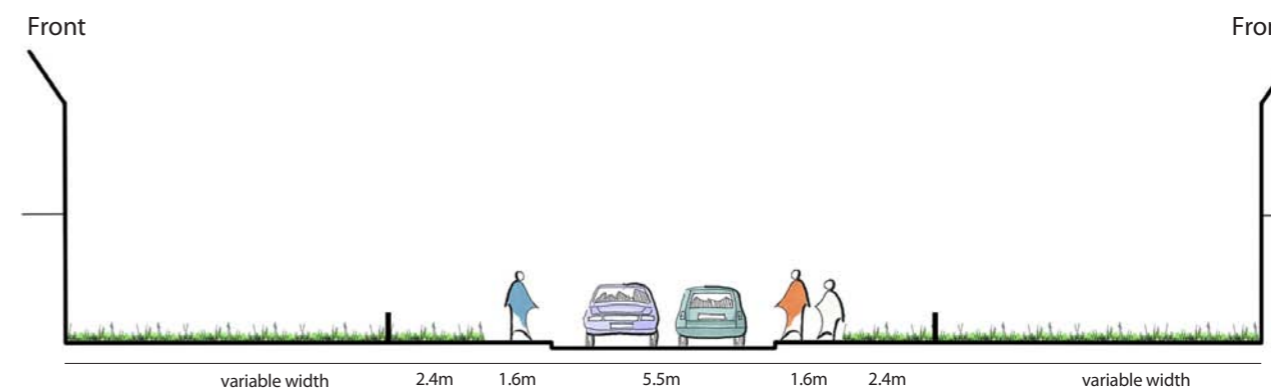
Section A cuts through a rural street in Welton demonstrating the set back of buildings from the road. Green verges, planting and landscape play an important role in defining the public realm
